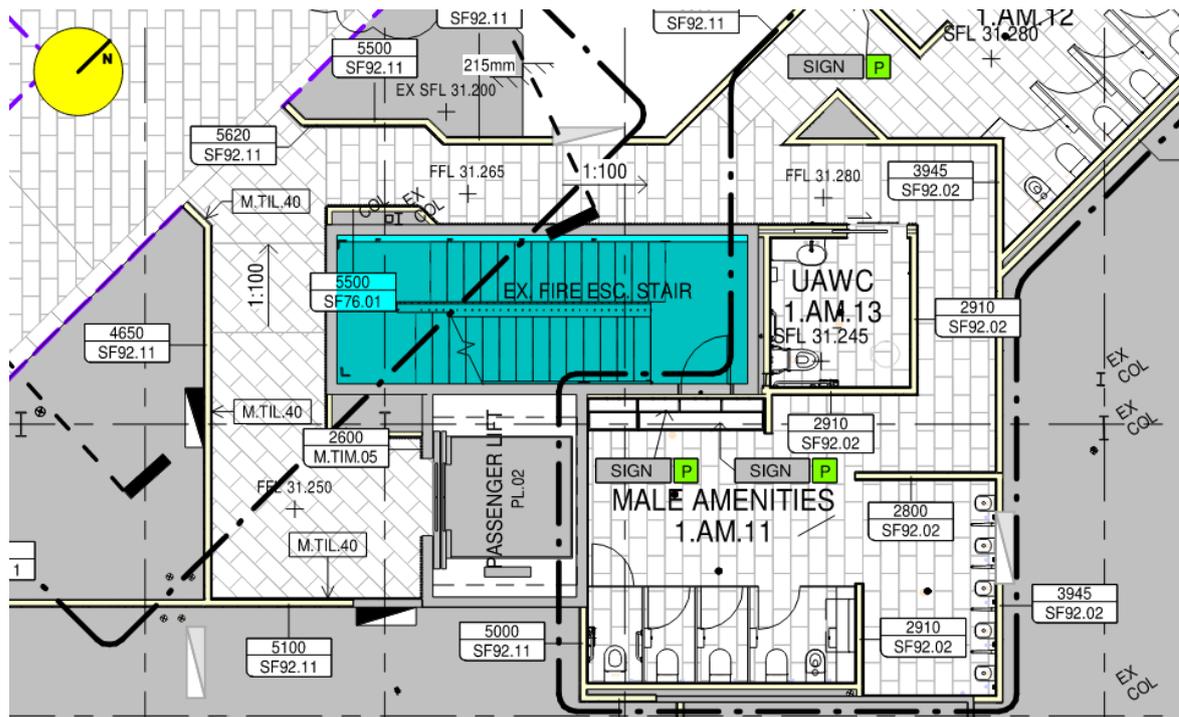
Existing stair north of passenger lift PL.02 – First Floor
